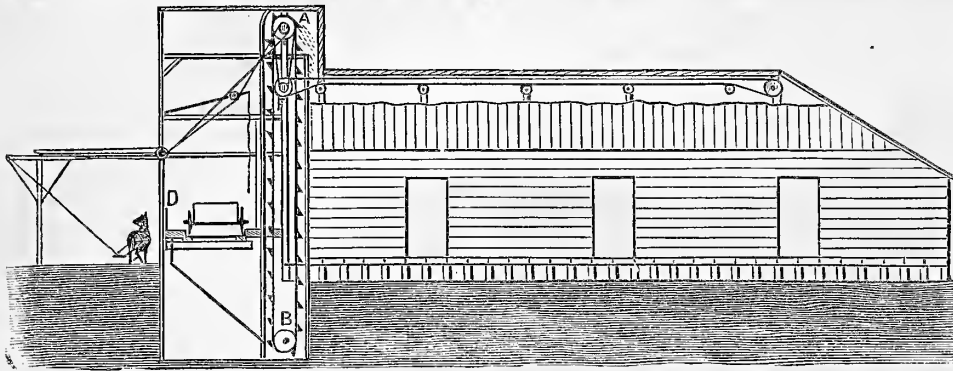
SIDE VIEW OF A LARGE KANSAS CORN HOUSE.
